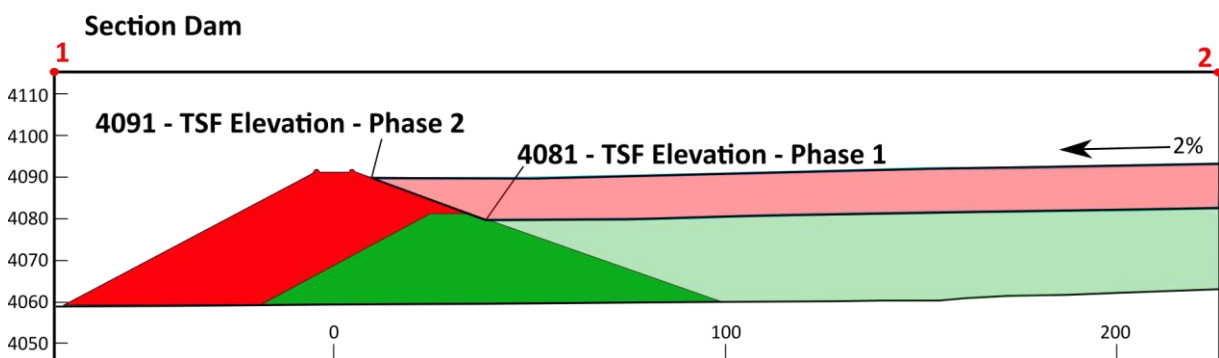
Cross-section view of phase 1 and 2 tailings dam
